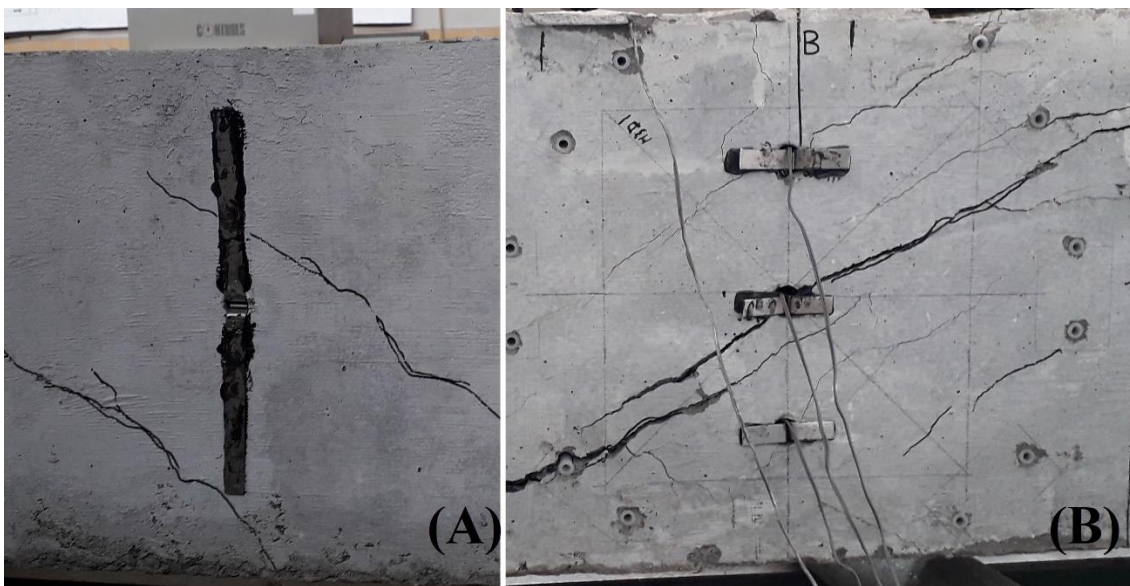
Aluminum Strip Plates Attached to Beam (A) Trial Beam (B) Main Specimens
